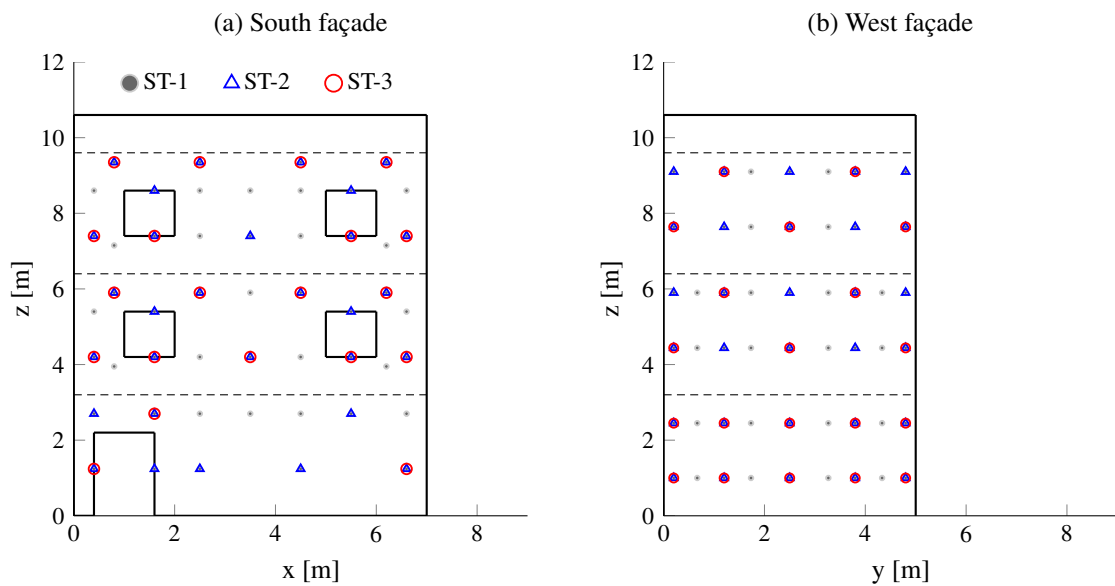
Measurement setups on south and west façades consisting of 20 (ST-1), 30 (ST-2) and 50 (ST-3) smart bricks.
